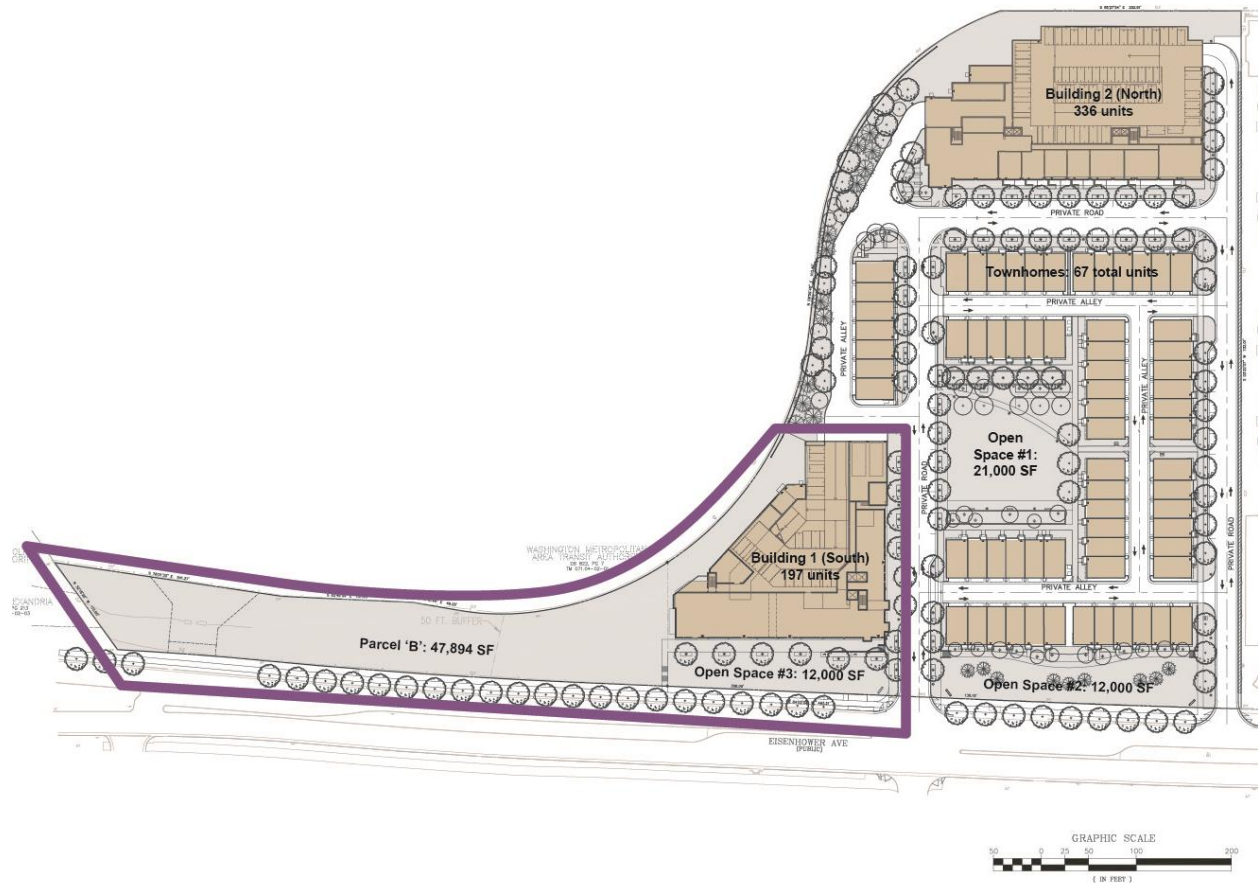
Rushmark Eisenhower South Tower Approved Final Site Plan Elevations
